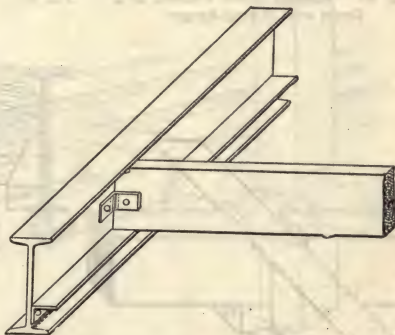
Wooden Beam Framed to I Beam with Shelf-angle
